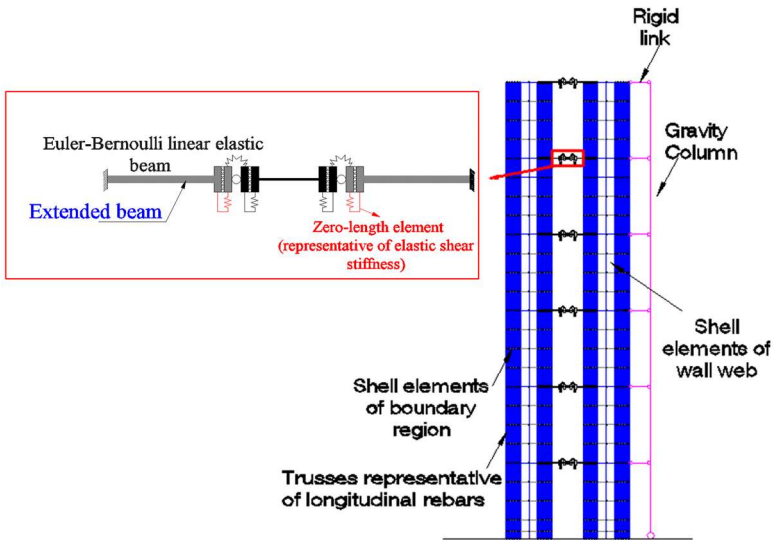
Finite element modelling for HCW system with replaceable steel coupling beam (HCW-RSCB case)
